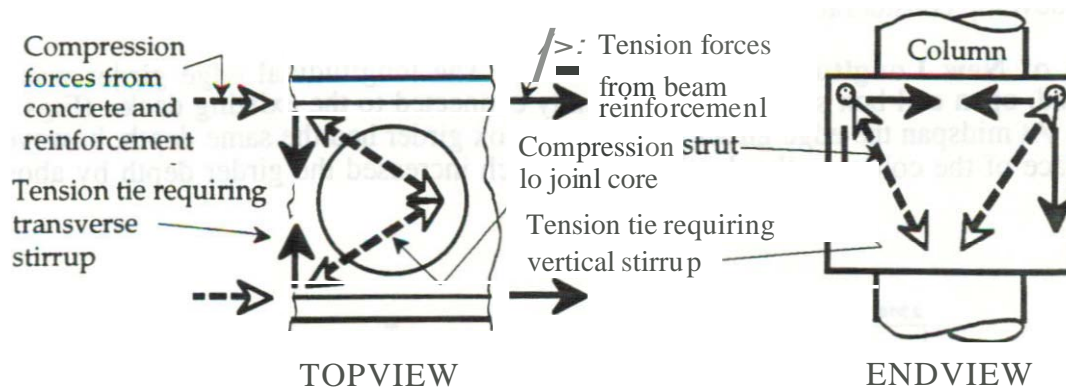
Inclined Three-Dimensional Strut Mechanism Used to Transfer Force from Girder Reinforcement Located Outside of Column Core to Column
